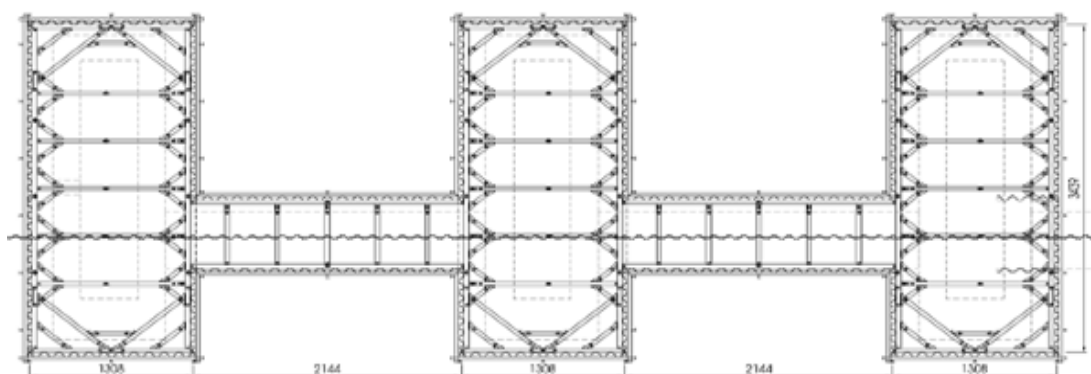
Steel sheet pile coffer dam for sluice gates construction
